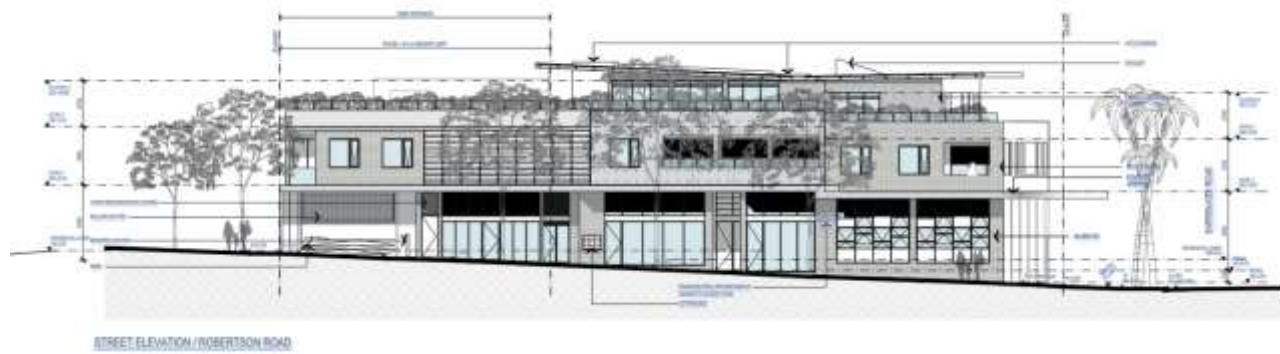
Proposed development north elevation (Source: Crawford Architects)
